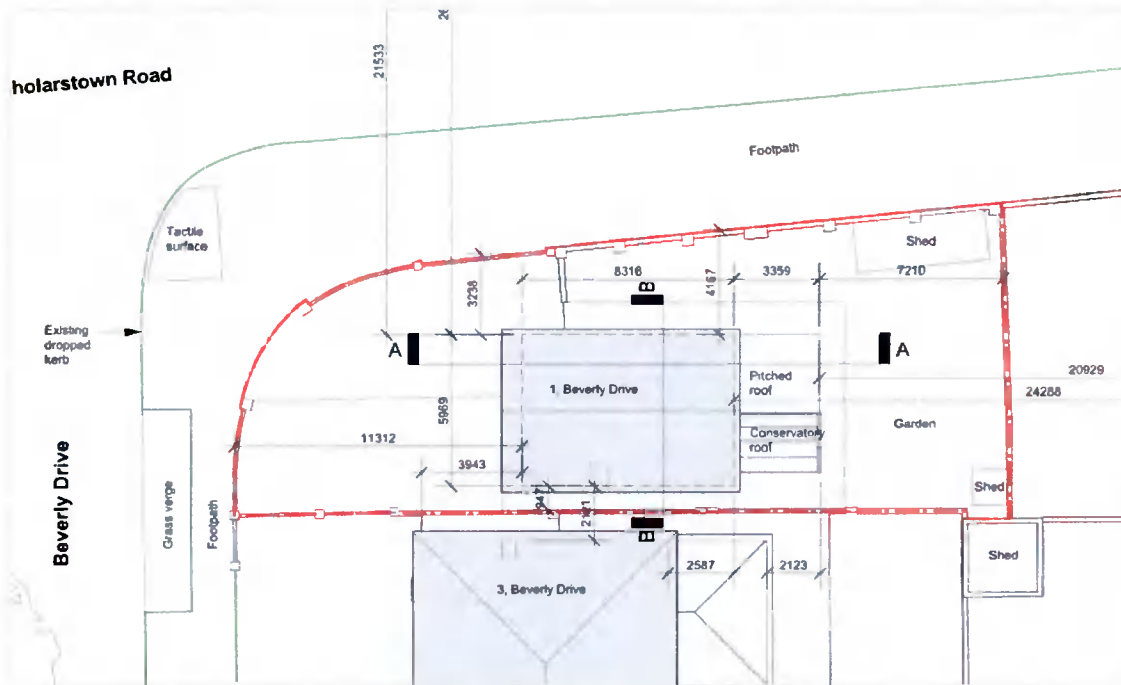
Existing site plan no 1 Beverley Drive. Site boundary denoted in DASHED RED
